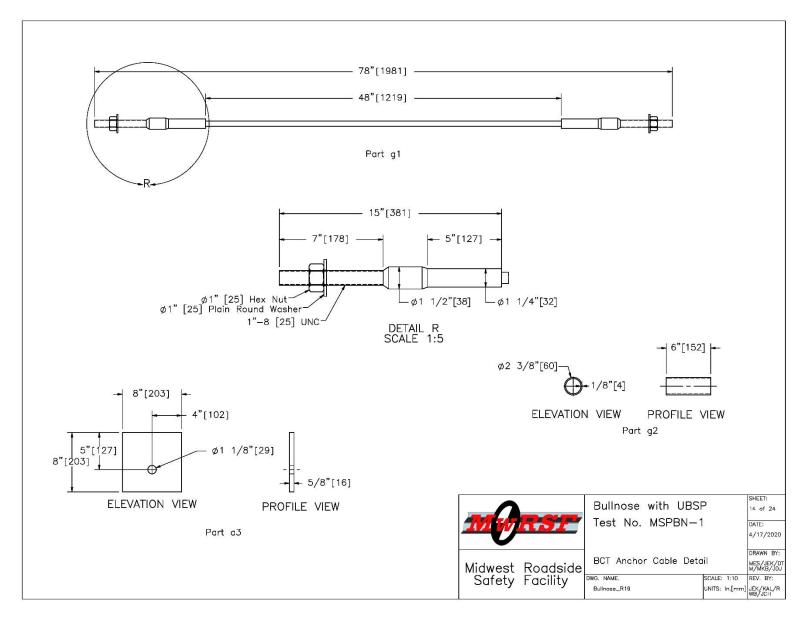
BCT Anchor Cable Detail, Test Nos. MSPBN-1 through MSPBN-3
